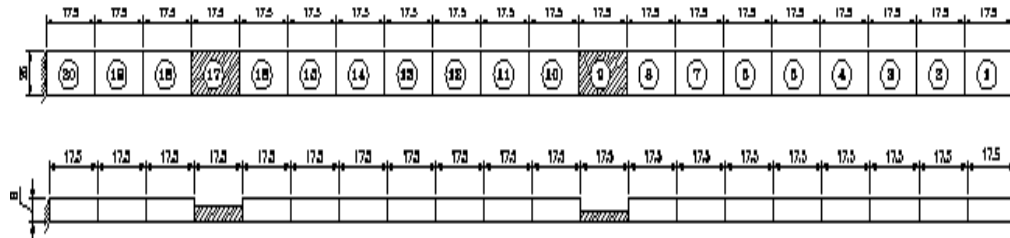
Plan and elevation of damaged (double element-2D9, 17) cantilever beam.
